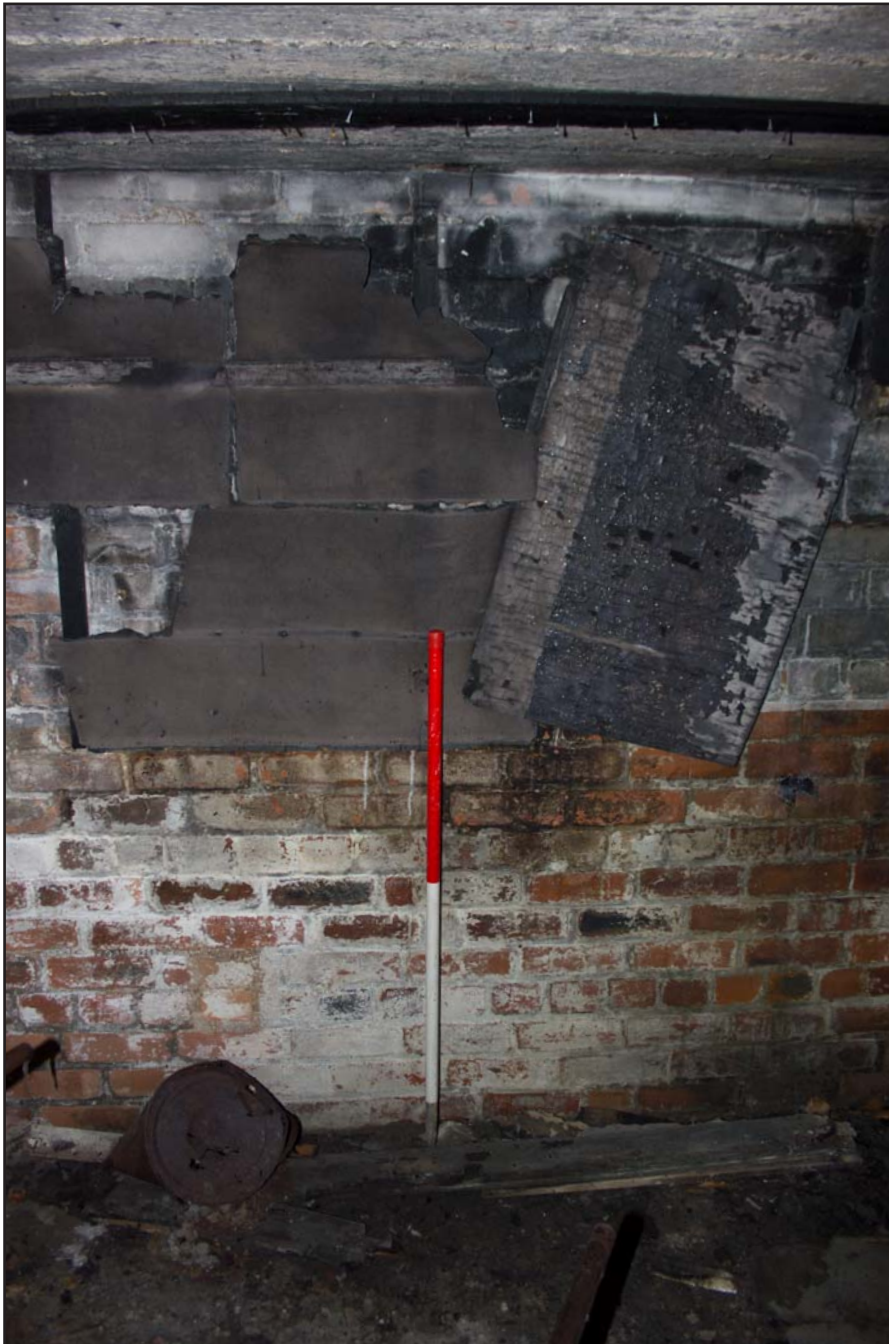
Air Raid Shelter 1 Main Room showing wall cladding, from the northwest. Scale 1.0m.
